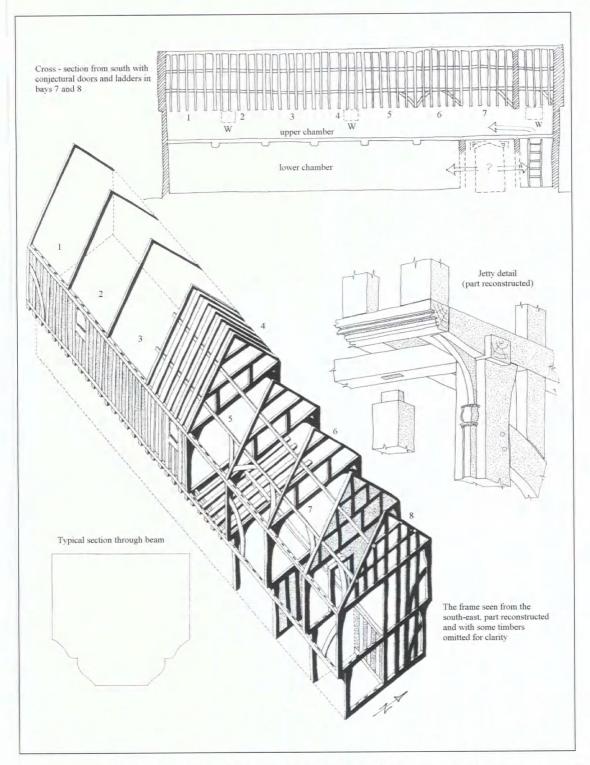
Timber Frame and Details at the "Town House", Kempston Church End
